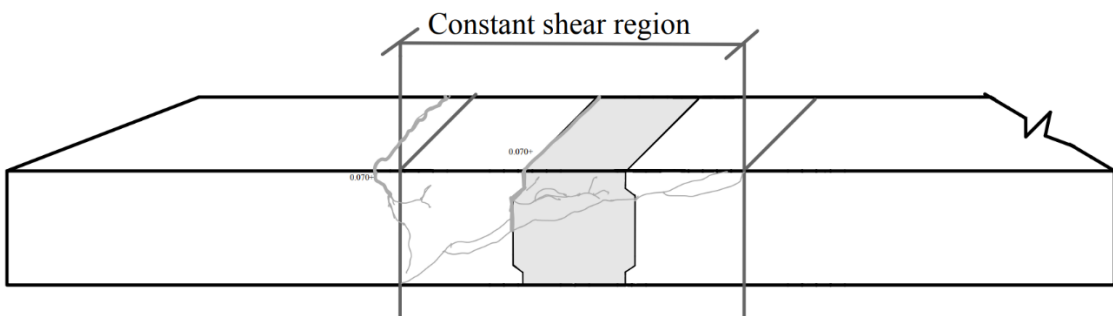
Crack Propagation for Non-Proprietary Short-Term Specimen at Failure
